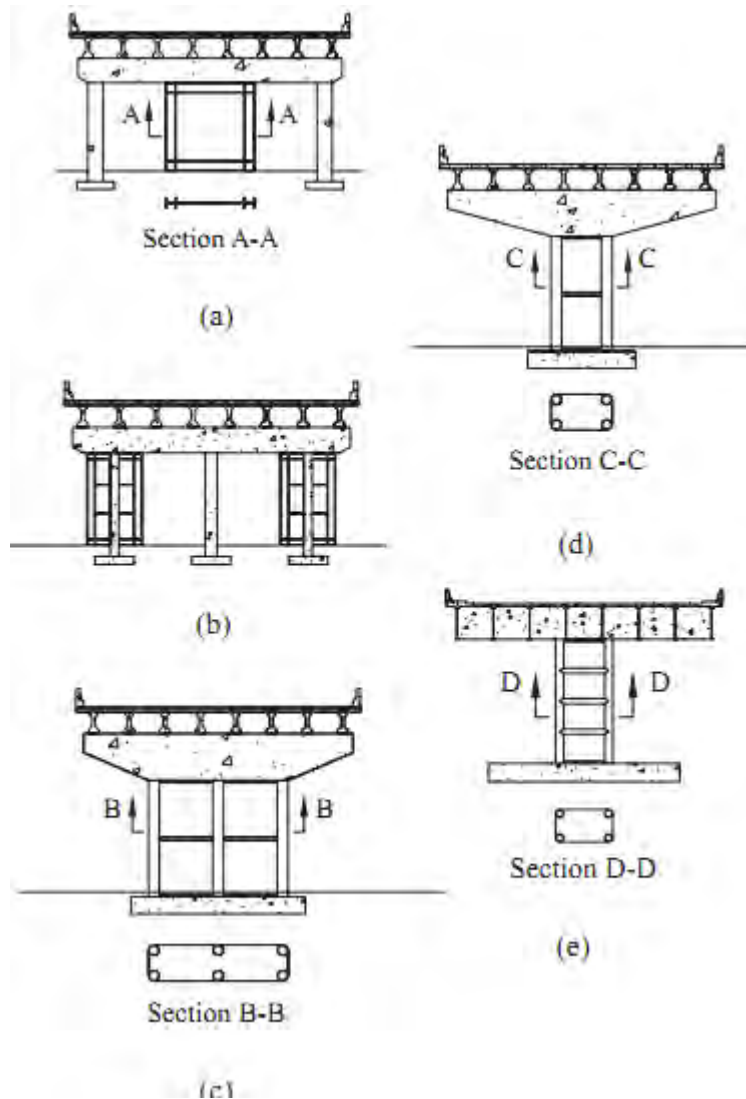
Multi-hazard Resistant SPSWs Bridge Pier Concept (Keller D., Bruneau M., 2009)
